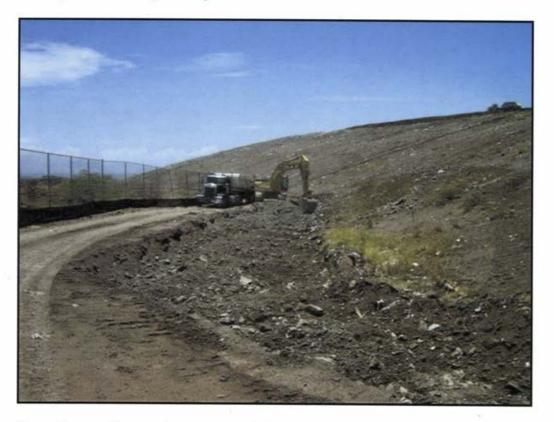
Excavating waste and interim cover soils to accommodate MCF soils and concrete trapezoidal drainage channel along perimeter road.
